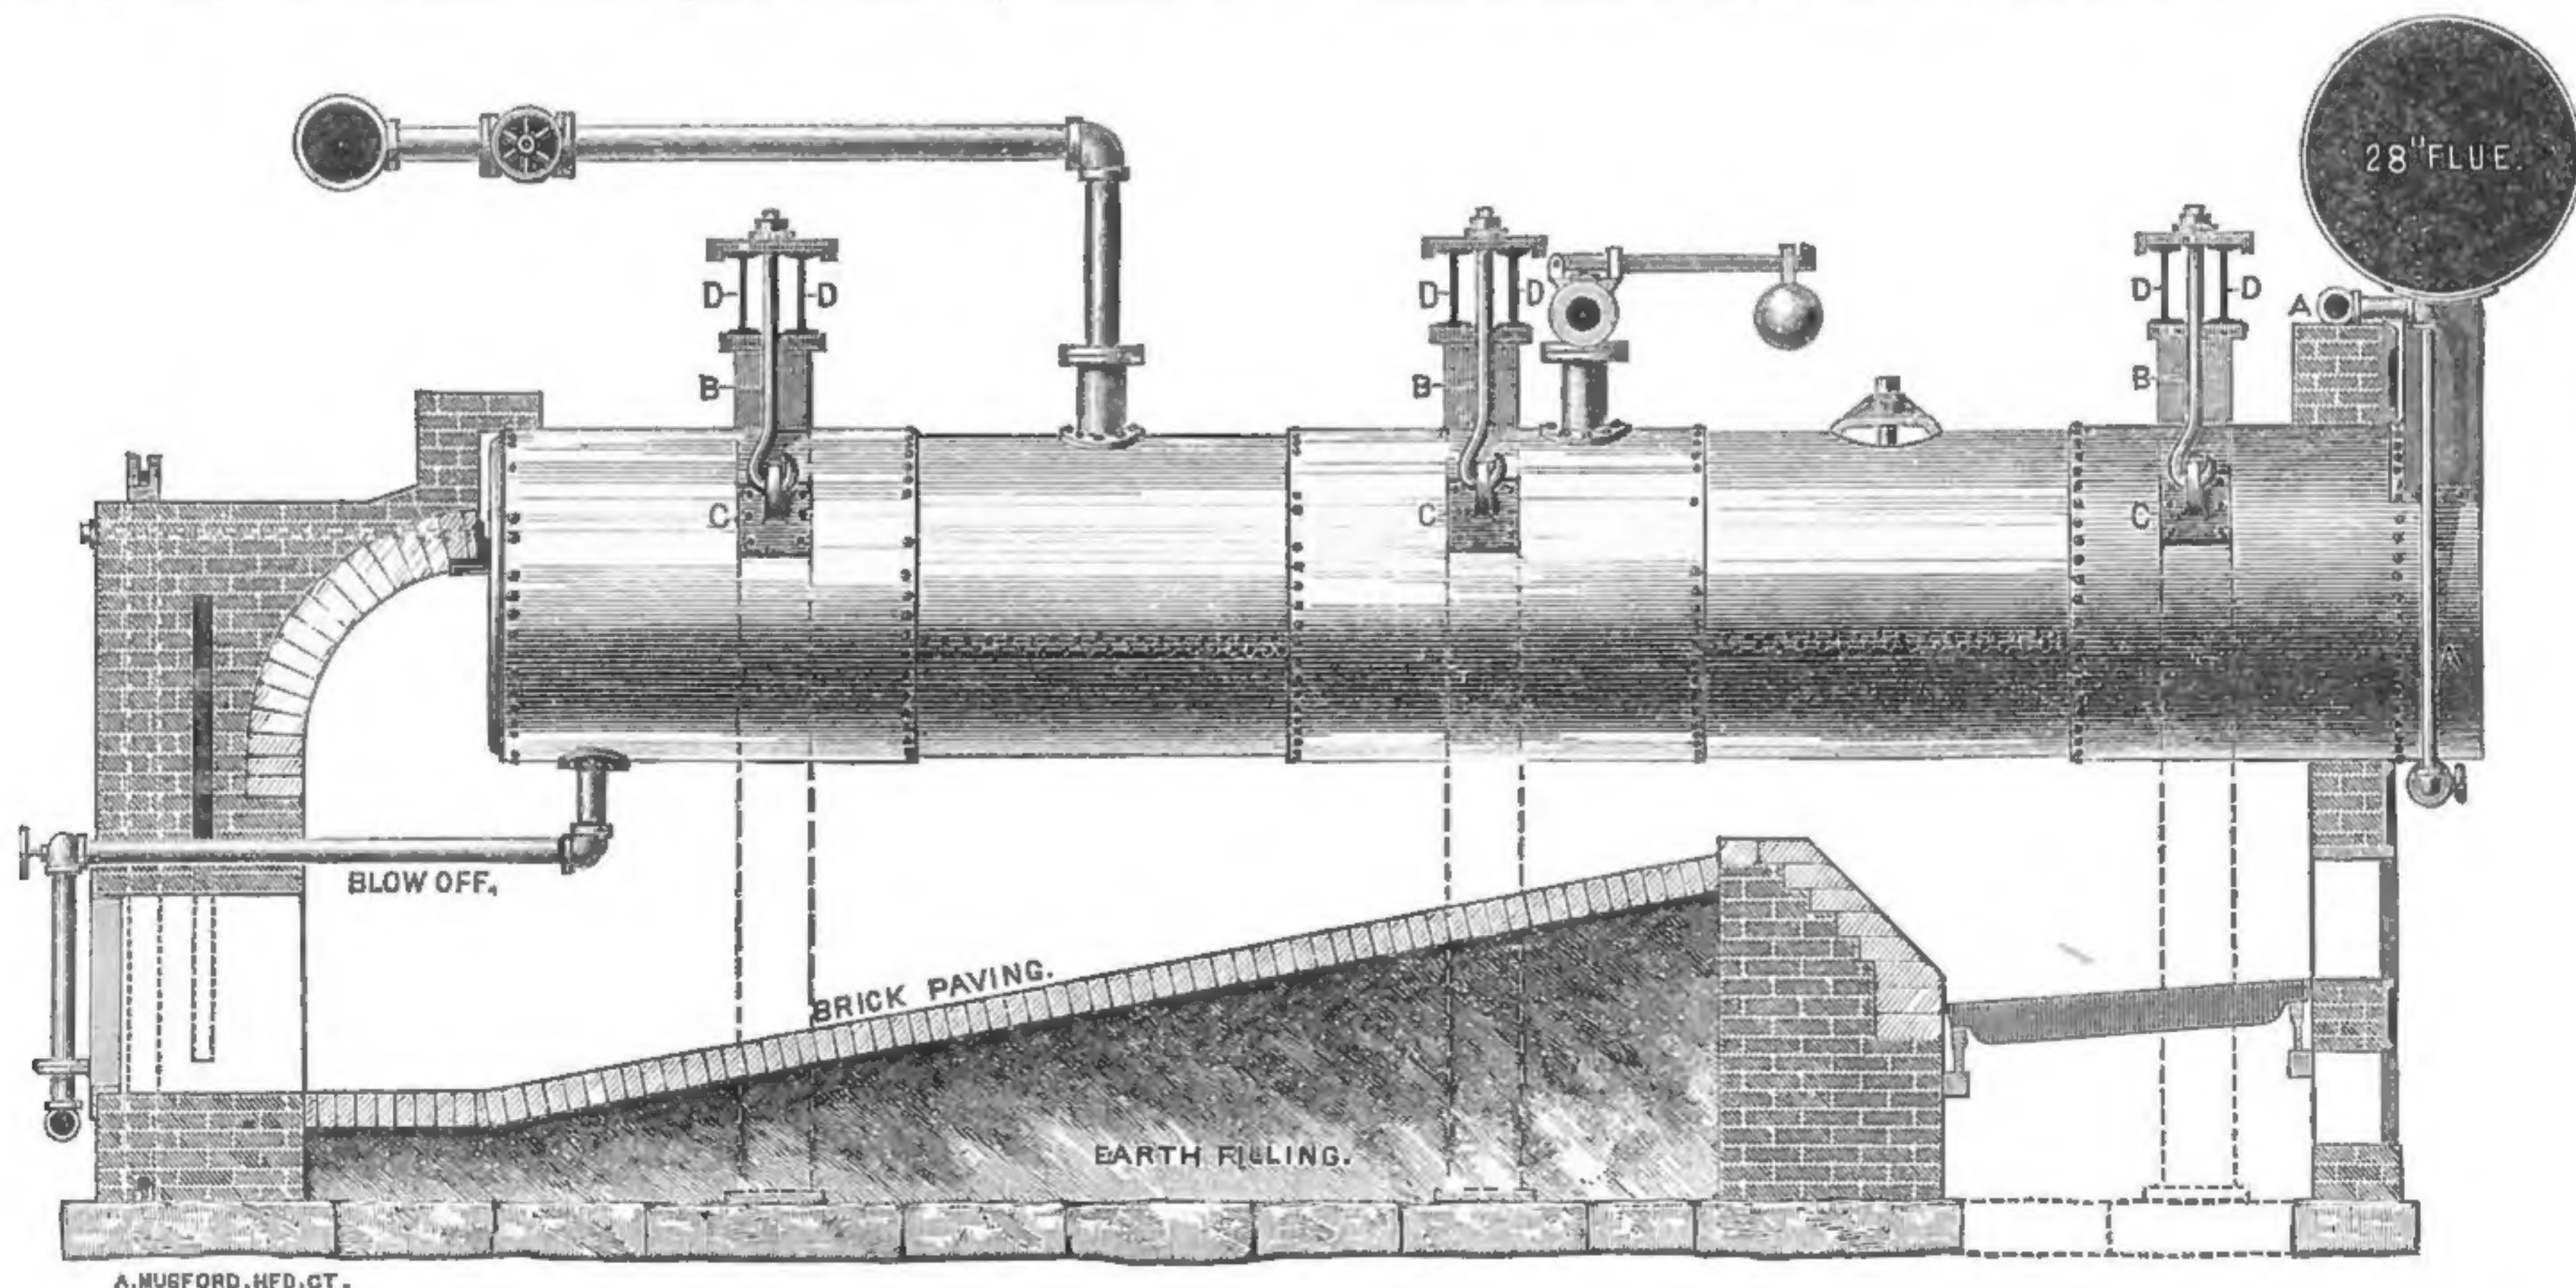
SETTING BOILERS OVER A SINGLE FURNACE.
